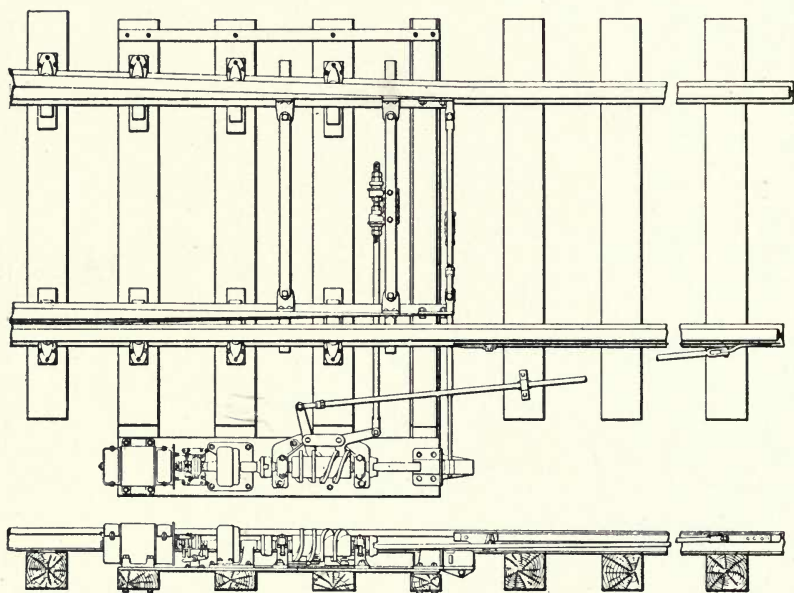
AND 27—PLAN AND ELEVATION SHOWING ELECTRIC SWITCH AND LOCK MOVEMENT
